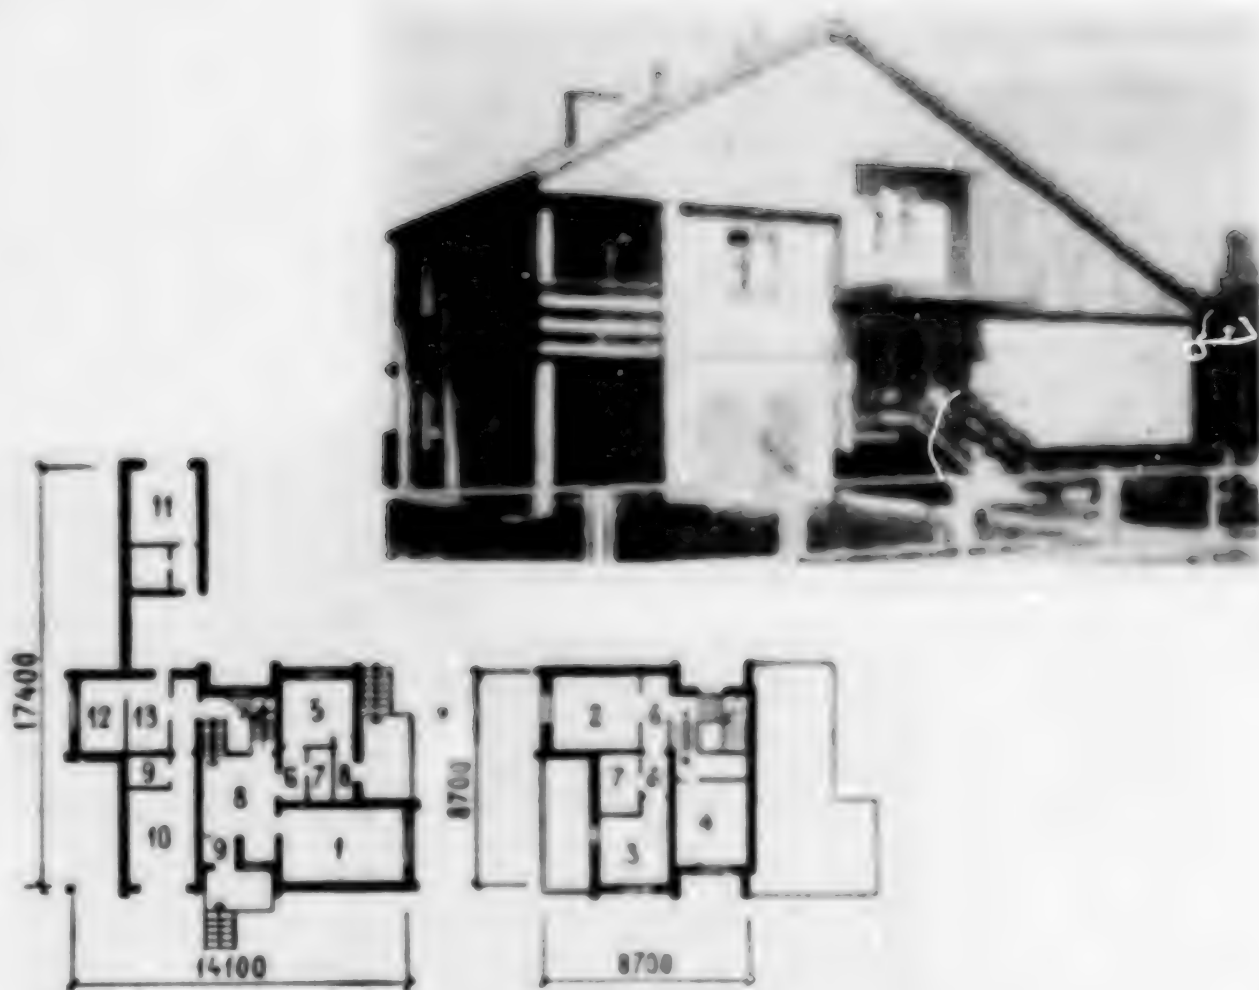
Single-occupancy House. 1--living room; 2,3,4--bedrooms; 5--kitchen; 6--hall; 7--bathrooms; 8--entrance hall; 9,12--storerooms; 10--garage; 11--livestock pen; 13--feed preparation room.
